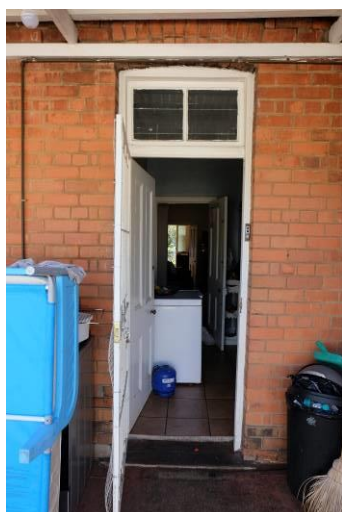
to 25\_Southern elevation towards the garden with windows and doors opening on to the back stoep
